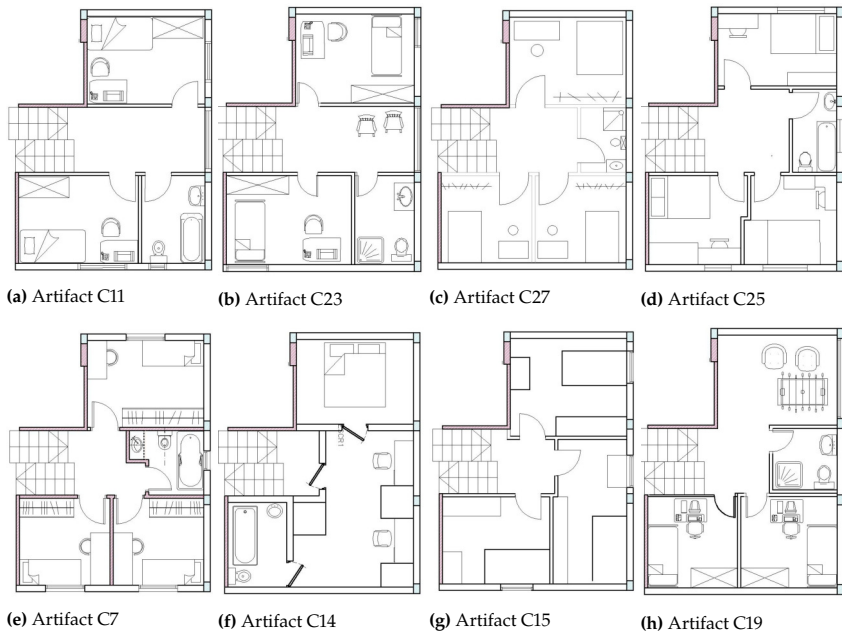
Level 2 plan artifacts (Experiment 14)
